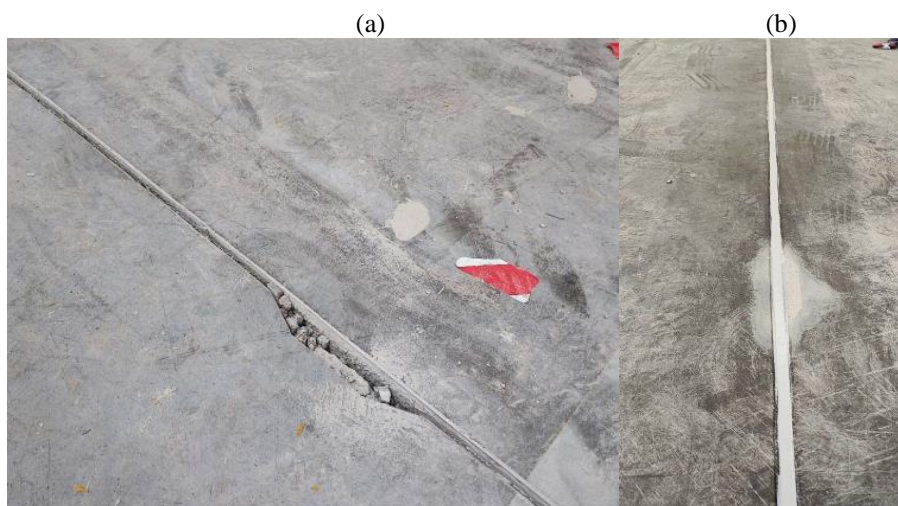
Concrete industrial floor (Example 4) during repair: a) visible loss of expansion joint edge, b) spot repair of expansion joint edge with restoration of infill [38]
